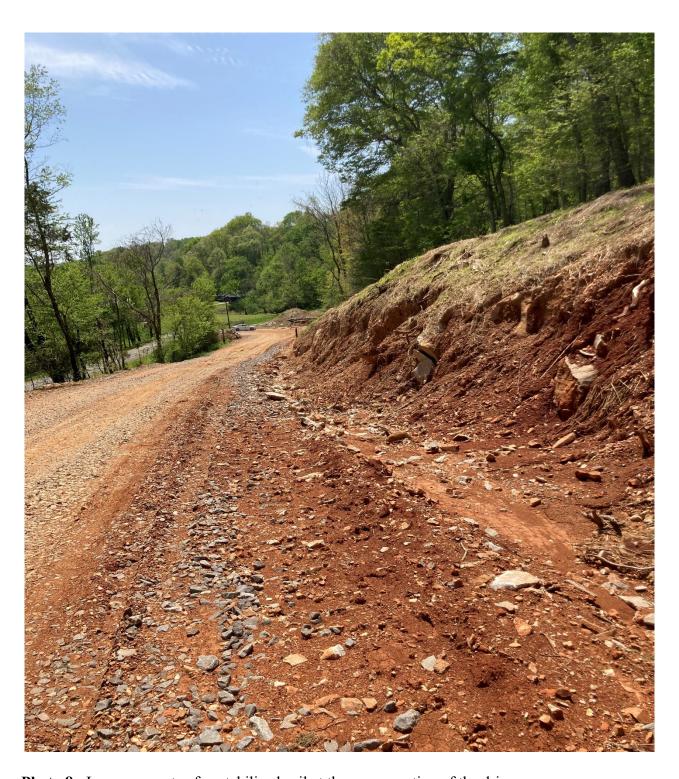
Large amounts of unstabilized soil at the upper portion of the driveway.
